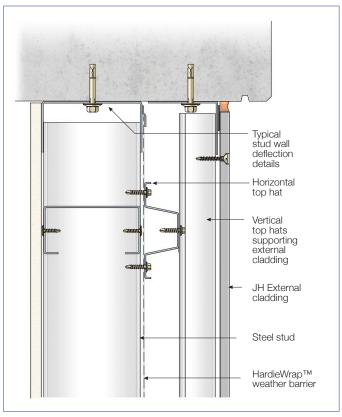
EXTERNAL STEEL STUD WALL HEAD
